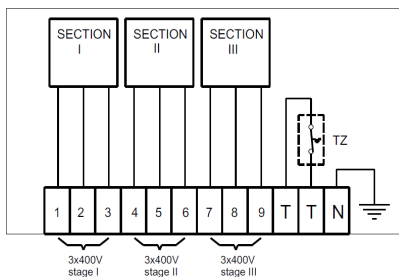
Example of heater and thermostat connection to a terminal strip in a three-stage heater
